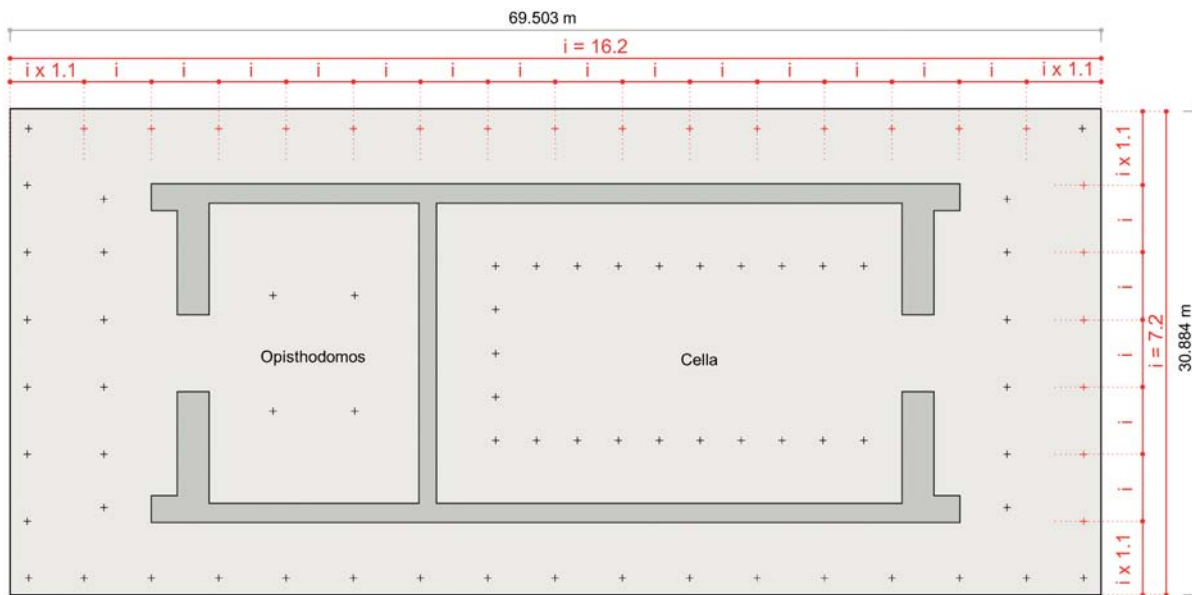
Parthenon, floor plan of the stylobate with position of columns.
